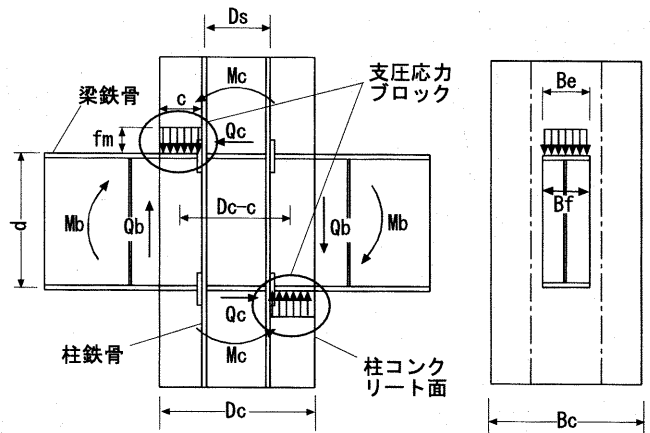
Assumed Load Carrying Model of Beam-Column Connection
